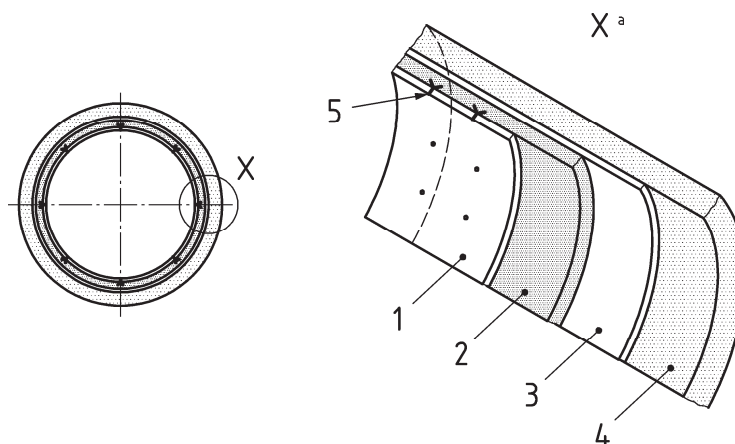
Typical wall construction of a lining system with inner plastics layer rigidly anchored in structural cementitious grout
